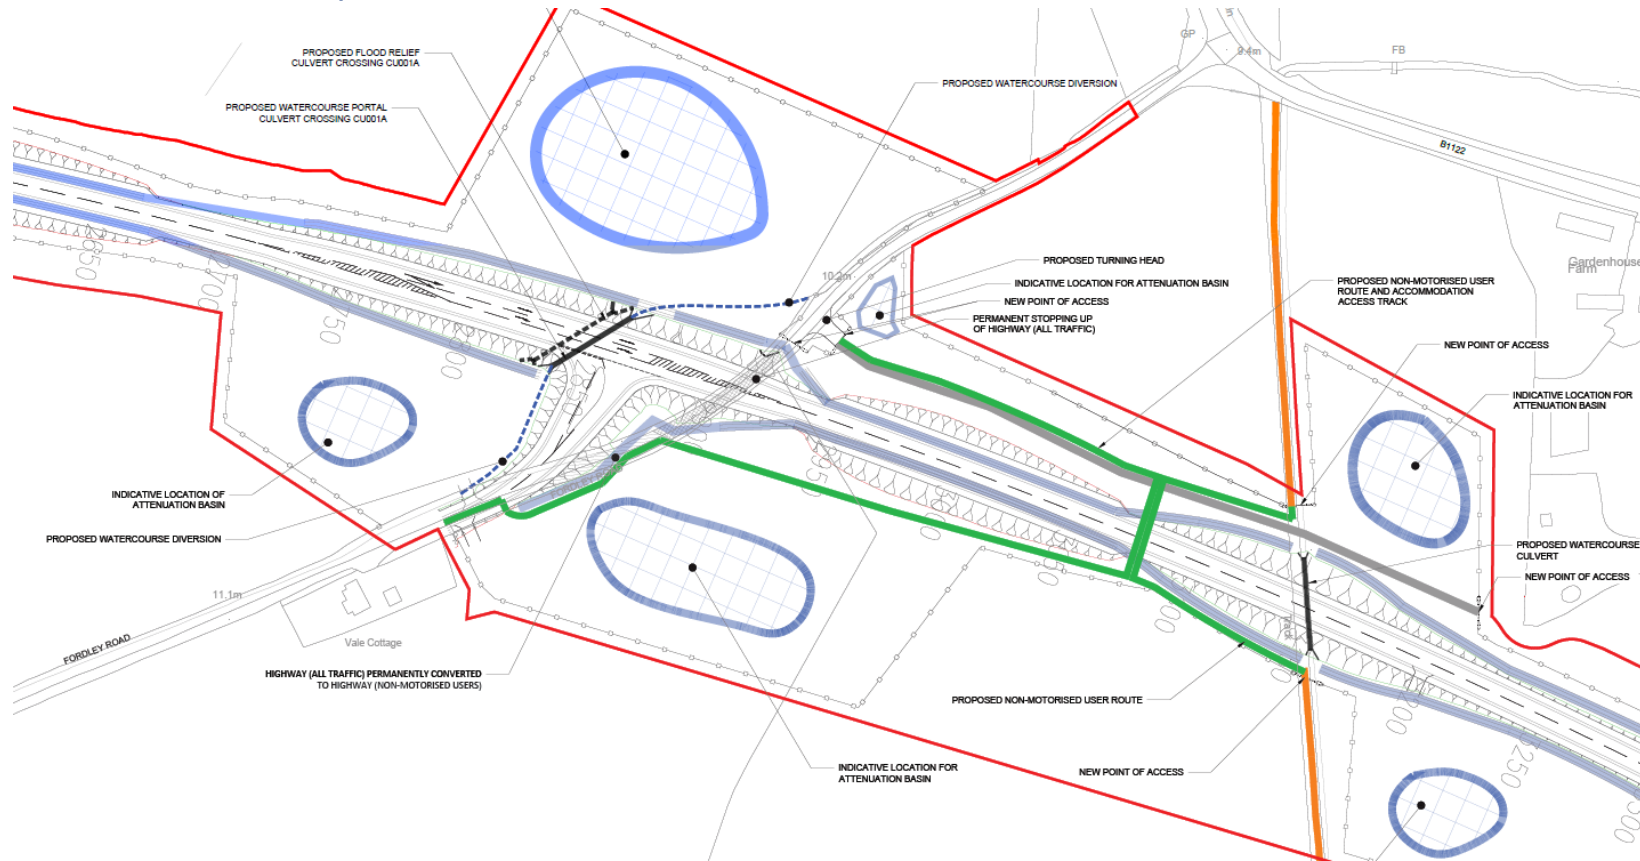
Indicative location of the attenuation basins at crossing 3 (Extract from drawing no. SZC-SZ0204-XX-000-DRW-100140 Rev 02)
